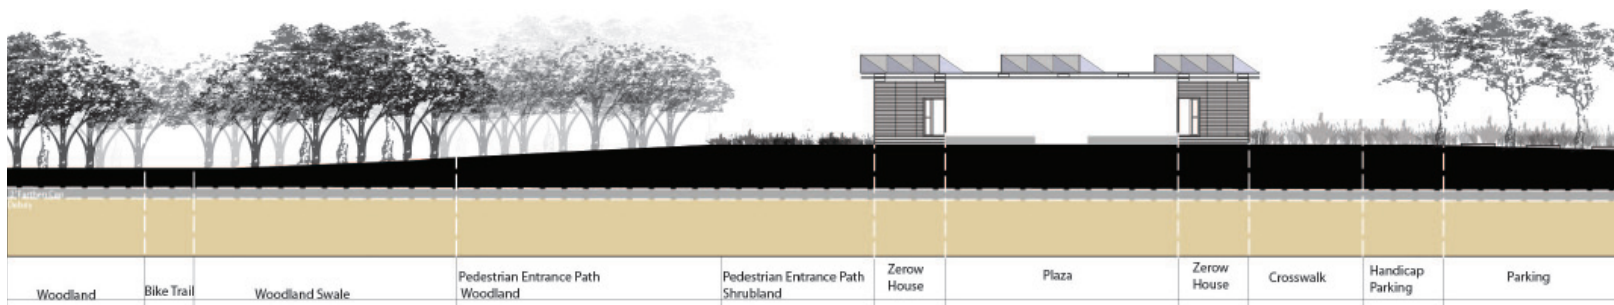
Section Looking South-East cut through Parking, Central Plaza and Entrance Trail
